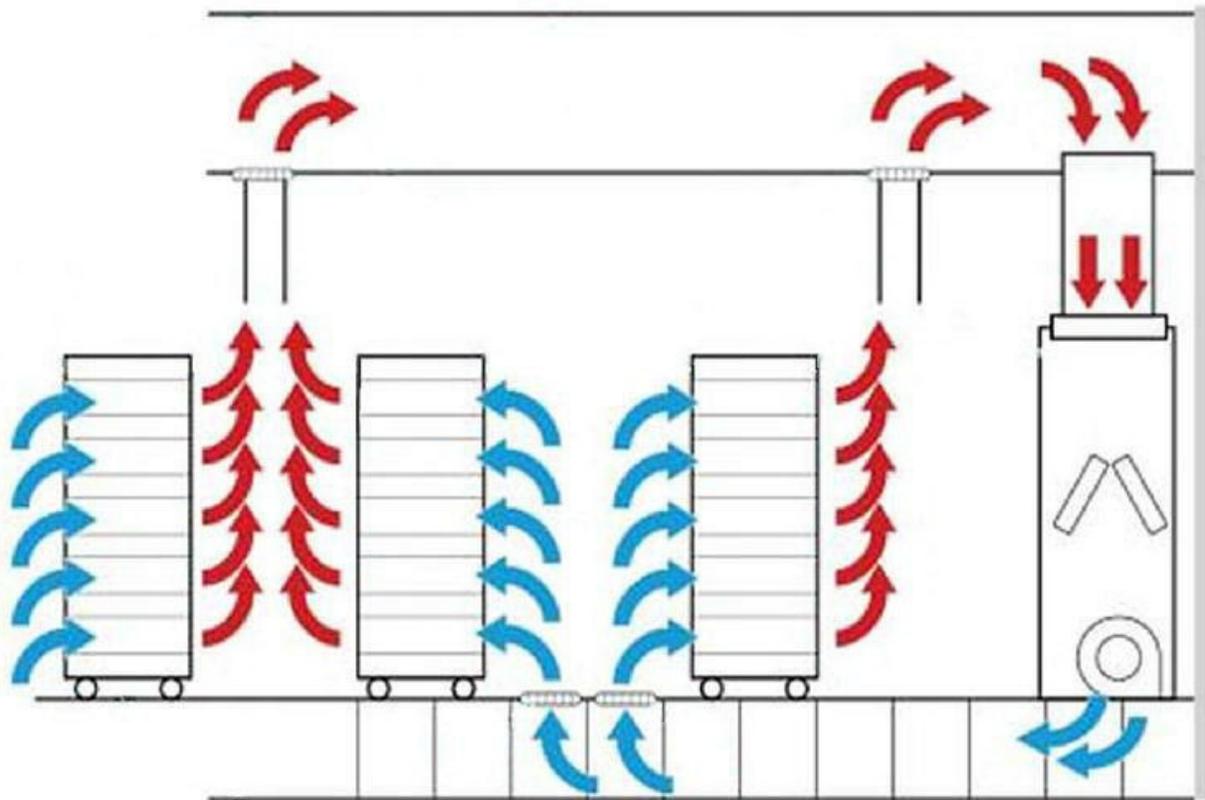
Rack placement for proper airflow in a data center with a suspended ceiling and raised floor
